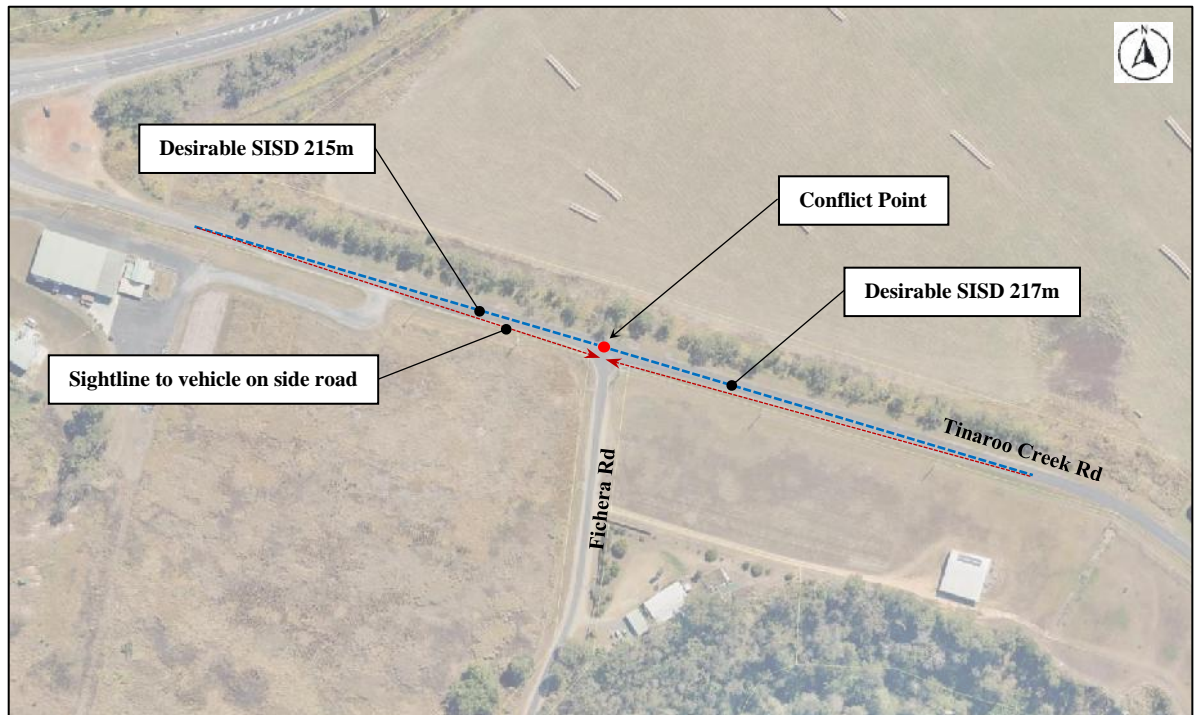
Tinaroo Creek Road/Fichera Road Intersection - SISD Assessment
